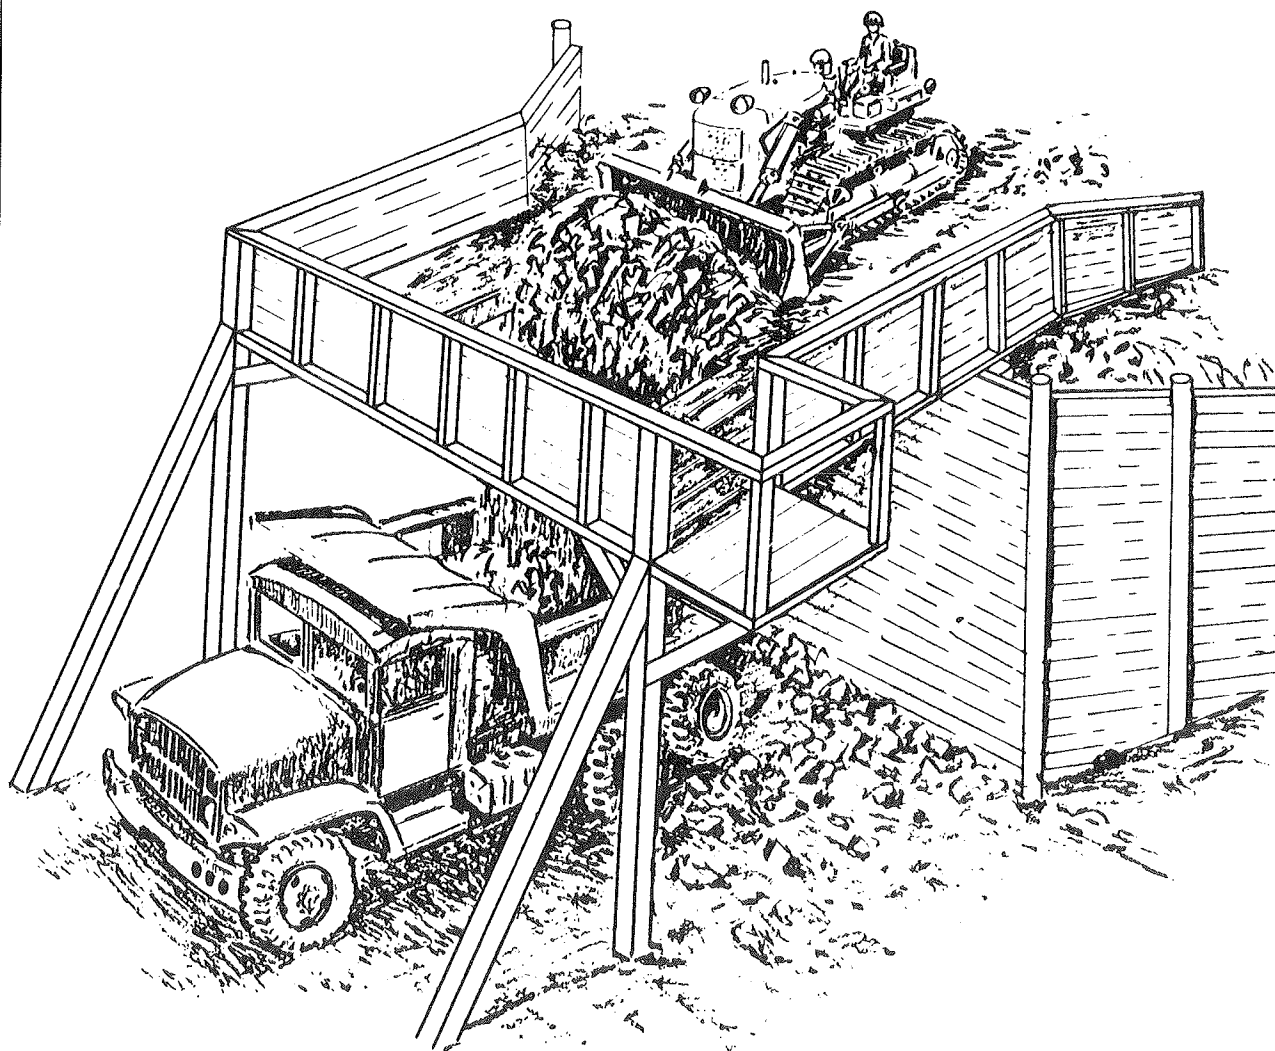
Single-end trap, truck-back-in, loading ramp.
